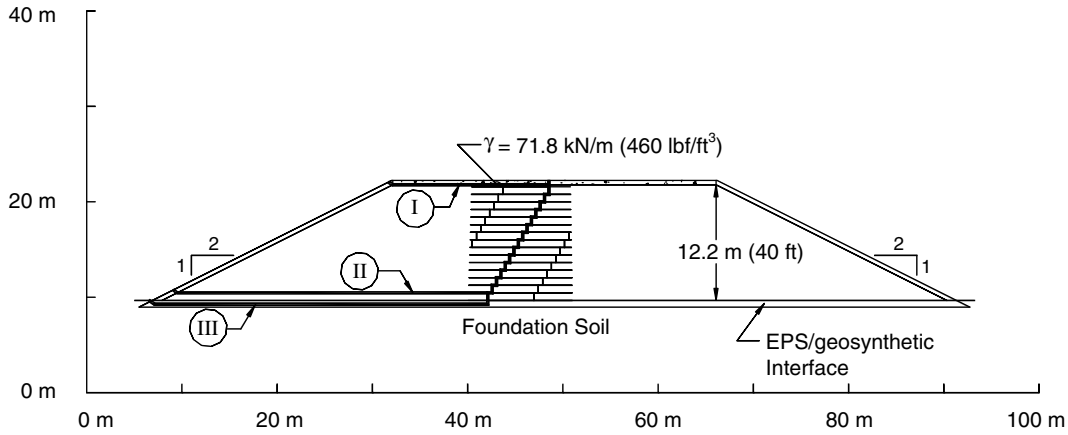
Typical trapezoidal cross section used in seismic internal slope stability analyses with the three applicable failure modes.
